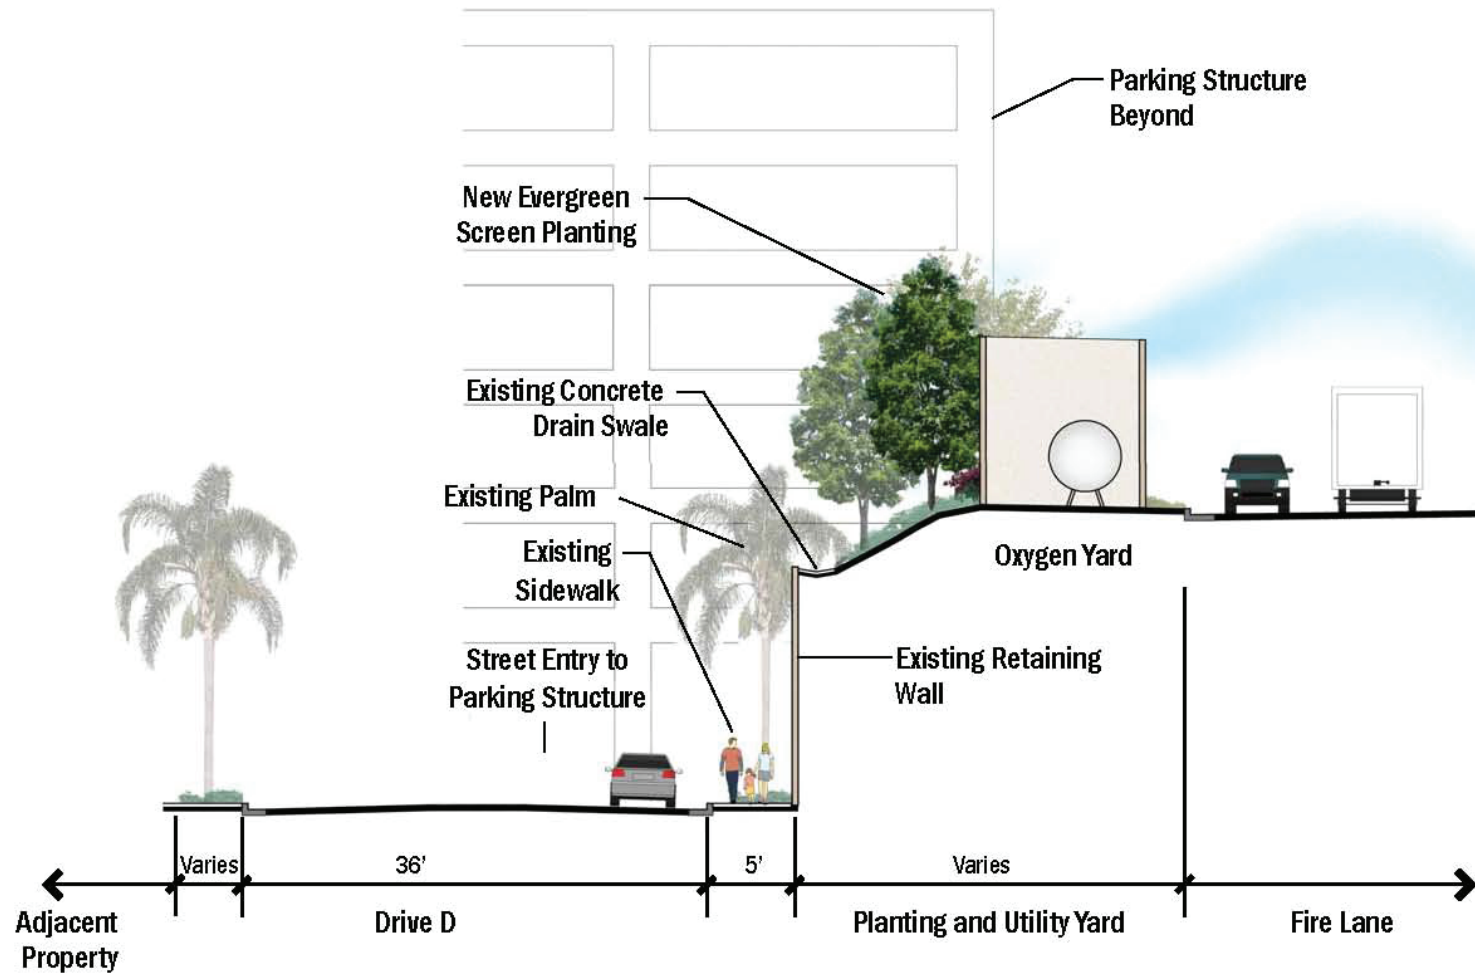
, Streetscape - Drive "D" at Bulk Oxygen Storage Area
